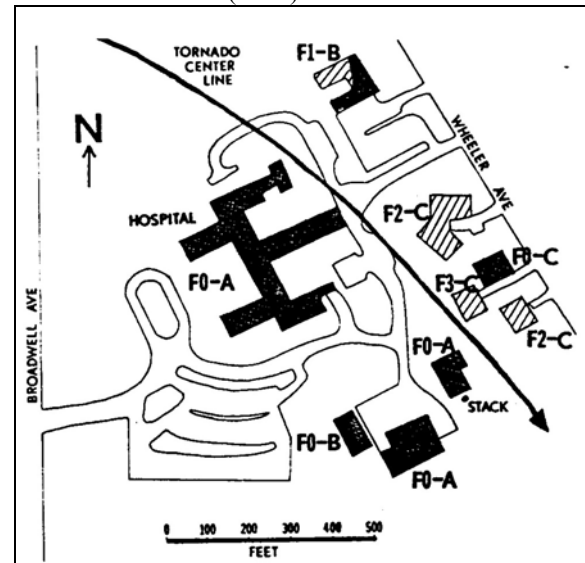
Plot plan of the Nebraska Veterans Hospital (dark shaded). Buildings with structural damage are hatched and classified according to F-scale and type (A-engineered, B-marginally-engineered, and C-non-engineered.)
